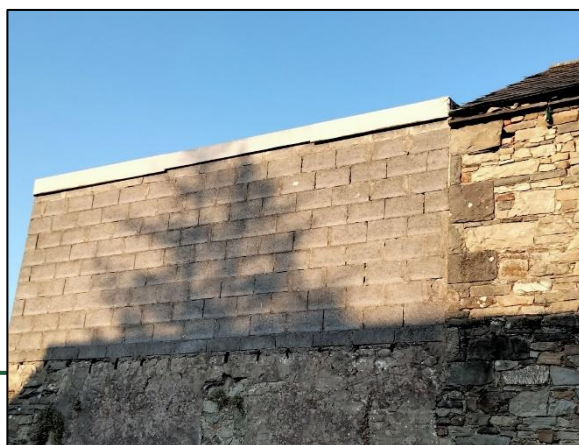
Building C Extension. Western aspect of flat roofed section of extension
